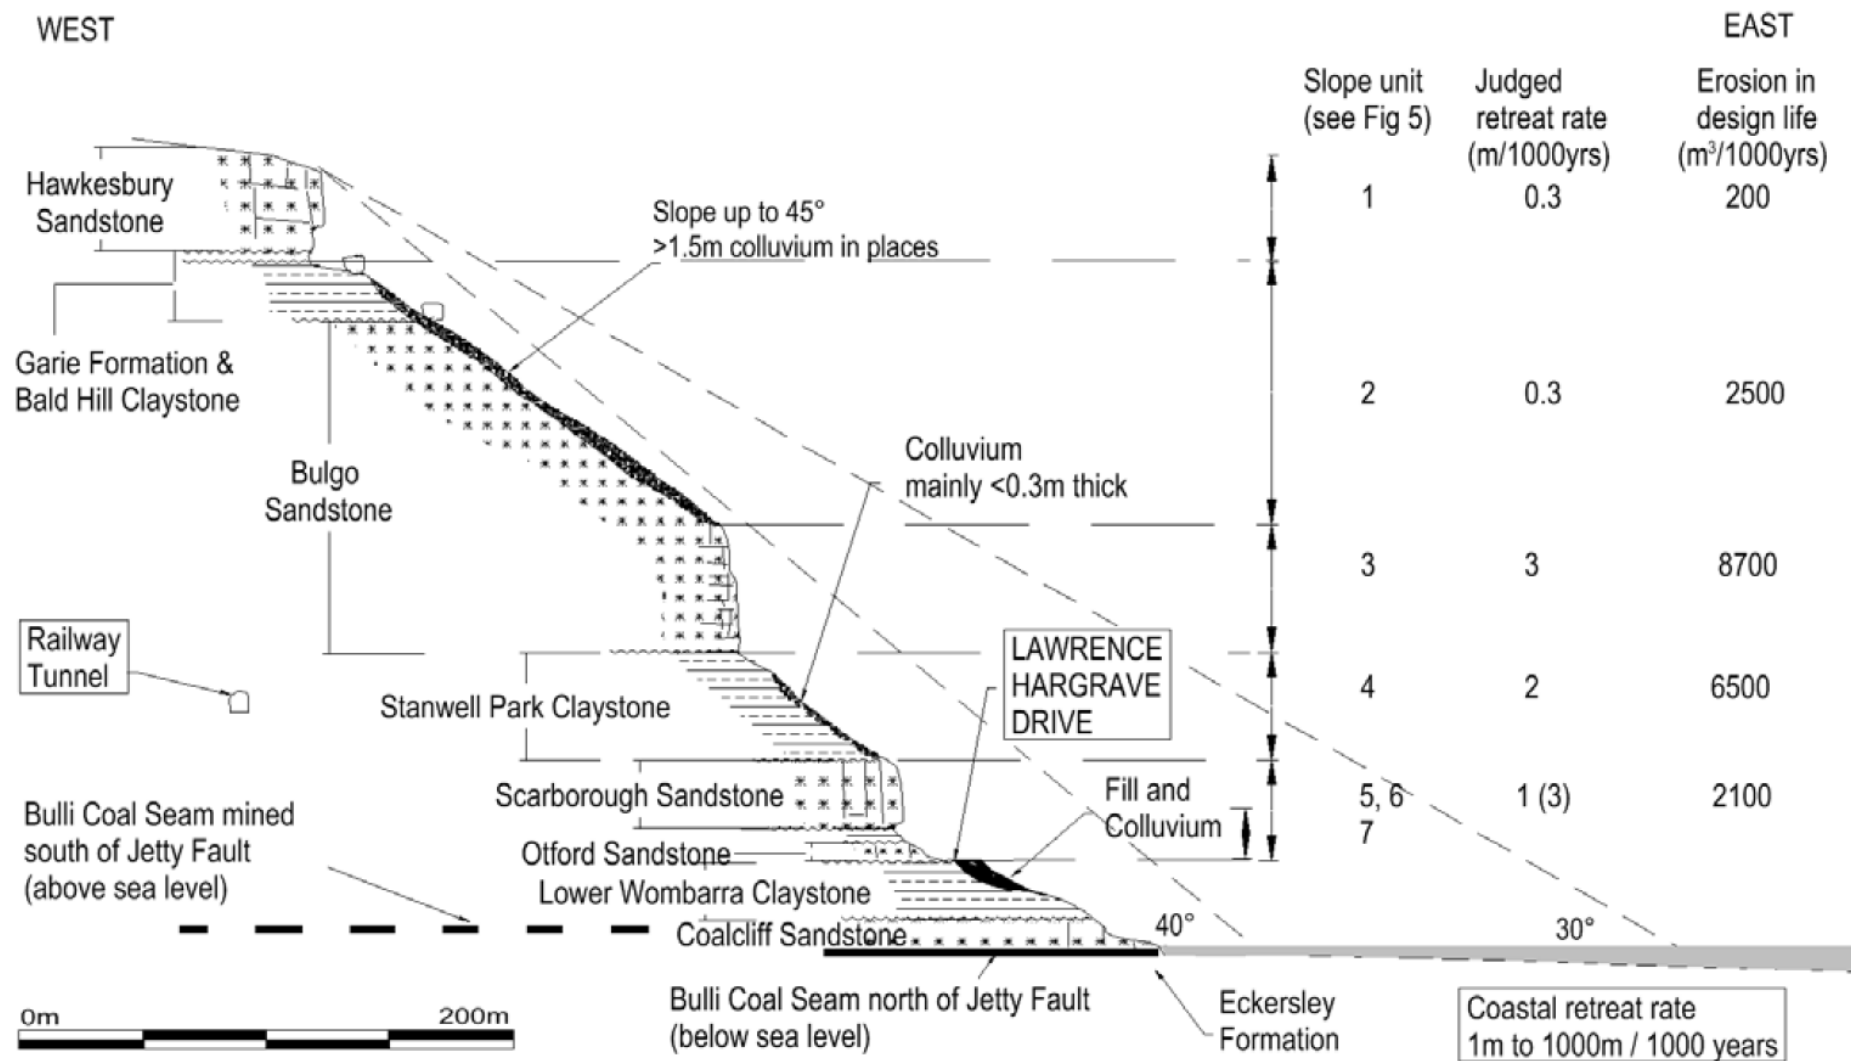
Cross section through GD2 that illustrates the landforms, geology and slope retreat rates
